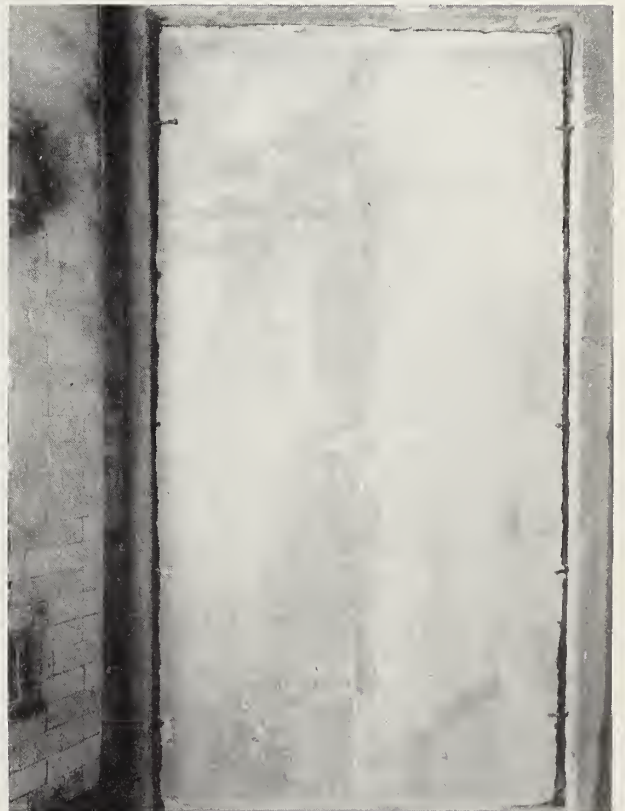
Fire-exposed face of a crushed quartz concrete wall slab after 1½-hr test.
